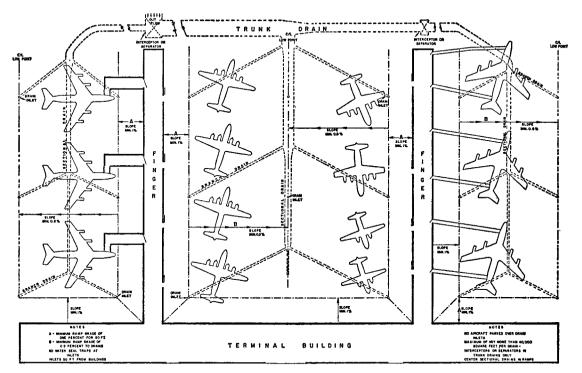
Another possible arrangement of an aircraft fueling ramp drainage system using drainage inlets without the optional water seal traps.
